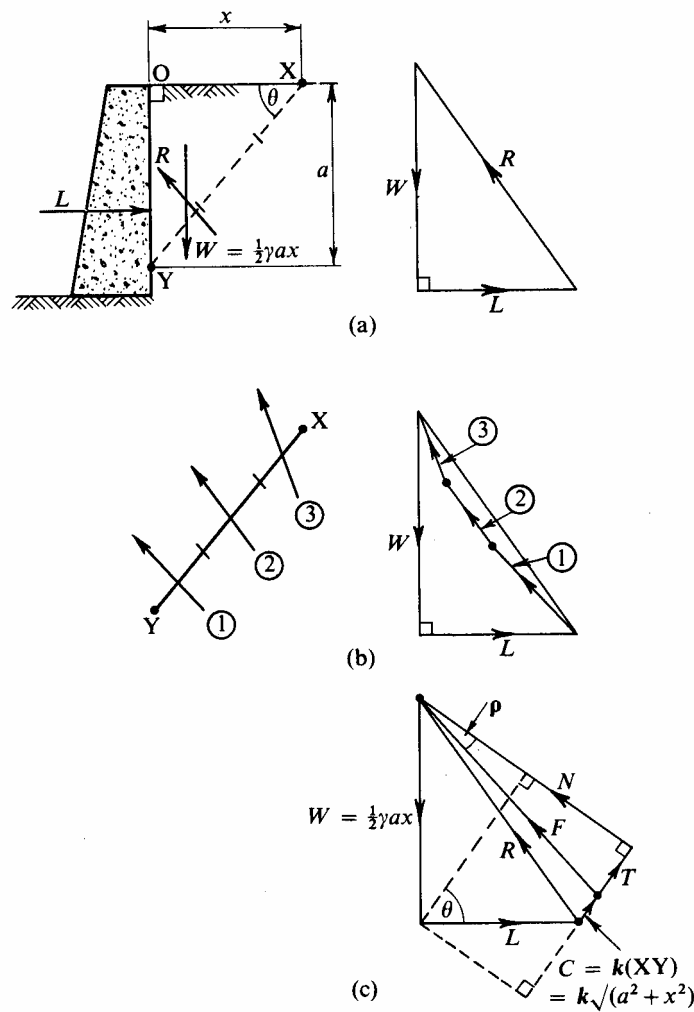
Limiting Equilibrium of a Retaining Wall
